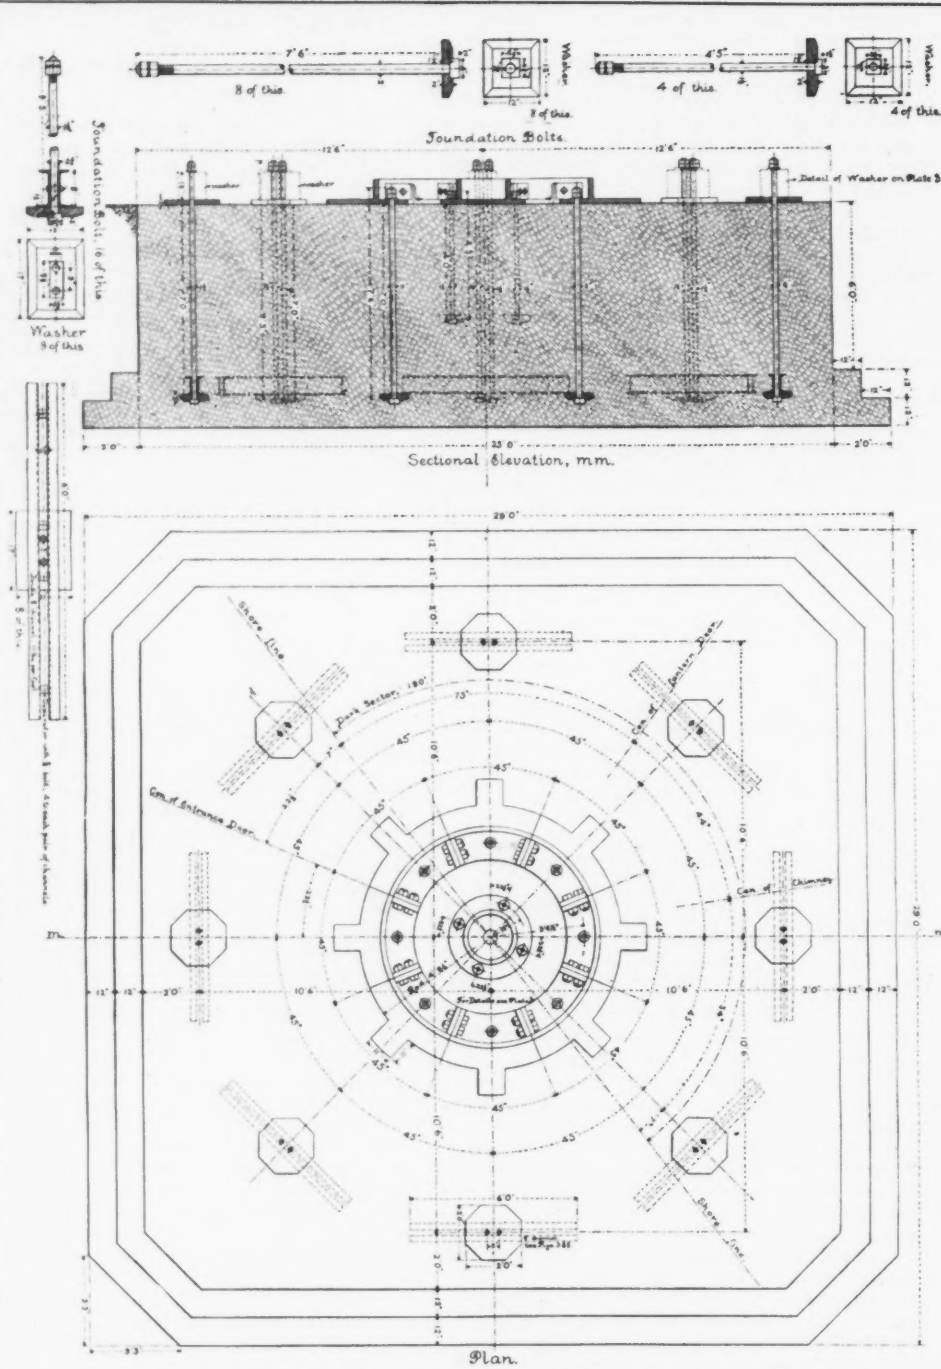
DETAILS OF CONCRETE FOUNDATION AND METHOD OF ANCHORING BOLTS.
